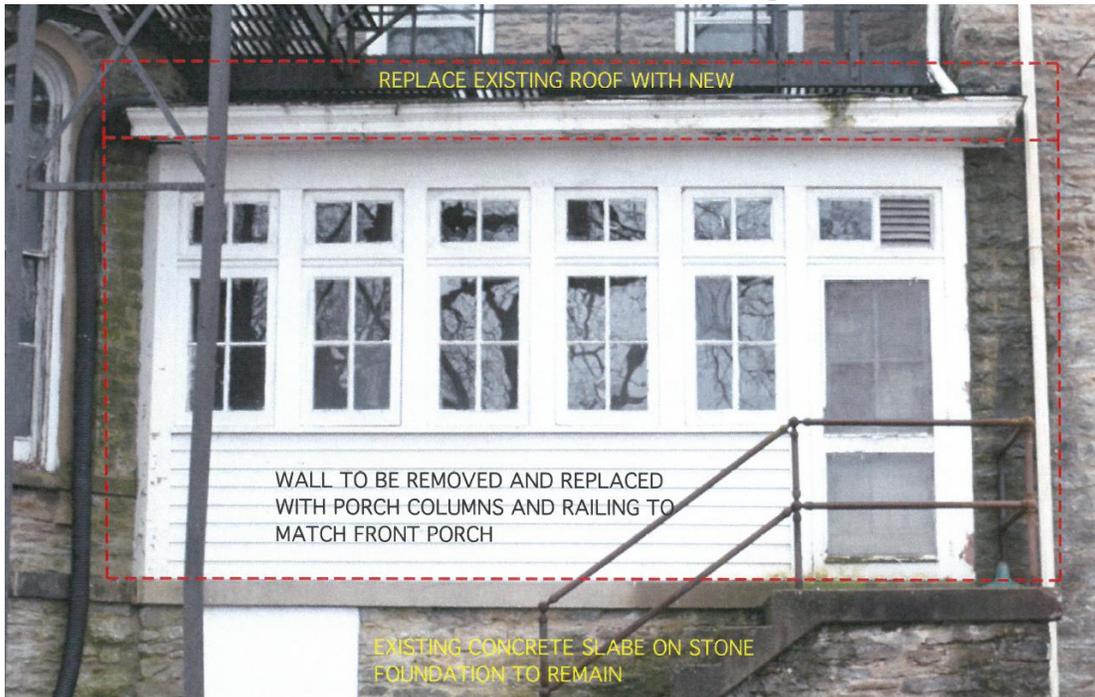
Detailed Photo and Plan of the Porch - Proposed
